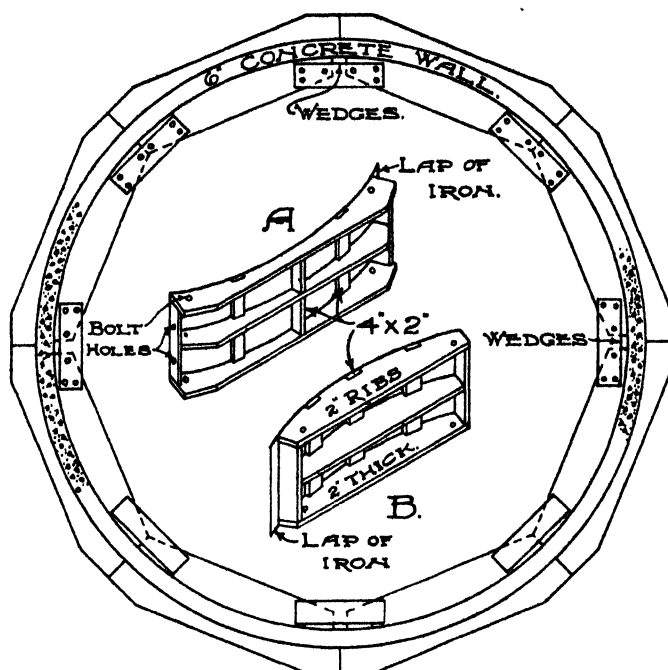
Plan of Circular Concrete Silo, showing Wooden Forms faced with Plain Iron.
